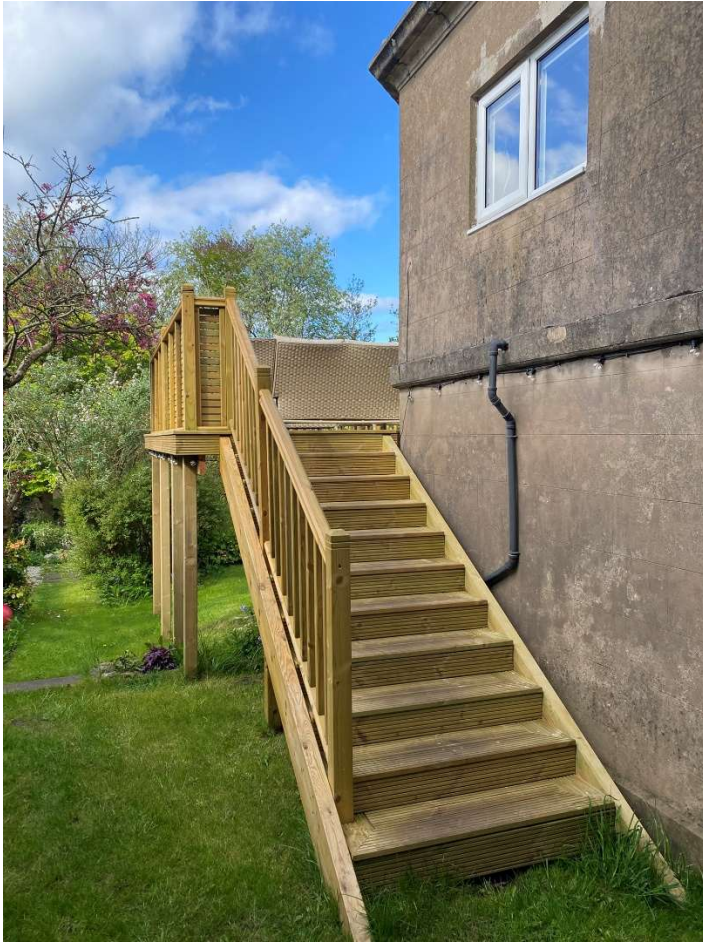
View of external steps to south side of deck with existing window to kitchen facing neighbouring property
